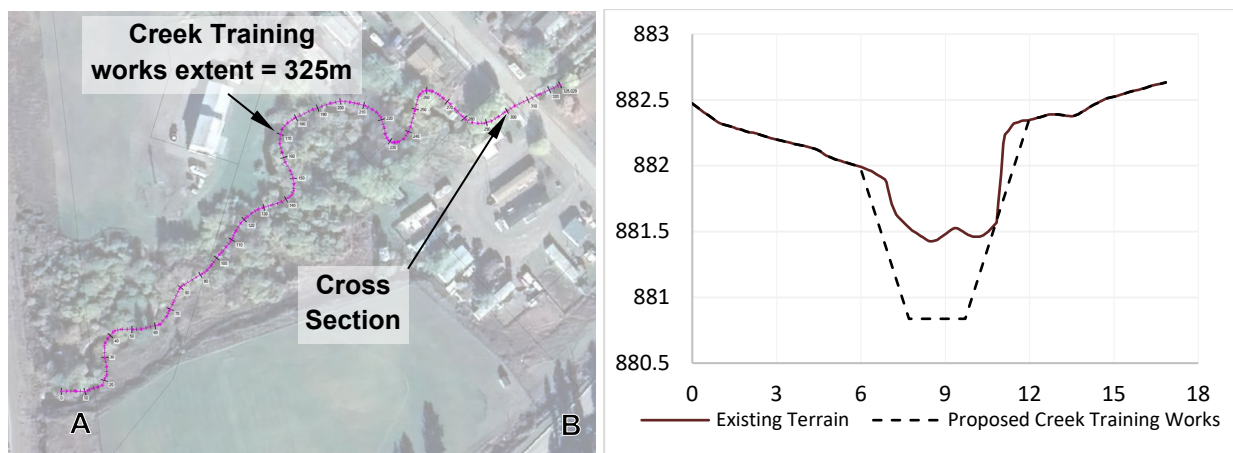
A) PLAN VIEW AND B) CROSS SECTION OF THE PROPOSED WORKS
